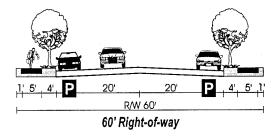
PROPOSED FAIRVIEW RESIDENTIAL LOCAL SAMPLE STREET CROSS SECTIONS
